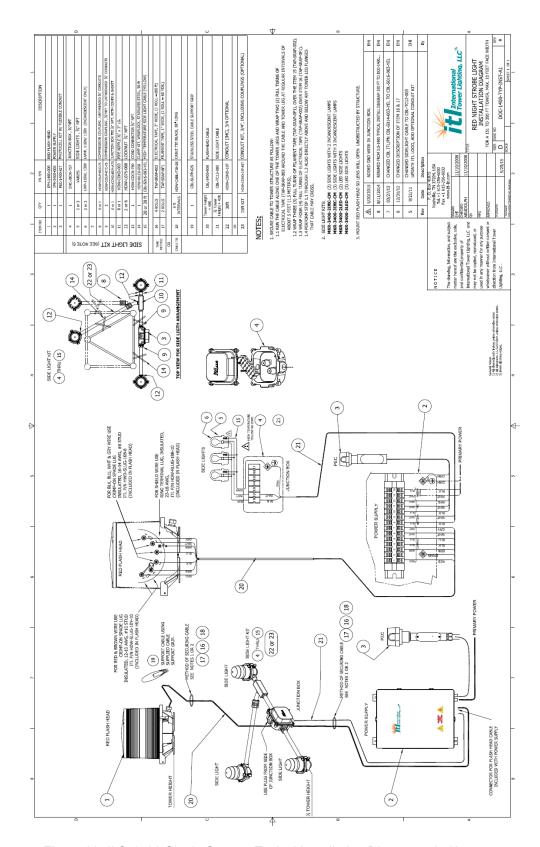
ILS-1400 Single System Typical Installation Diagram – 350'
